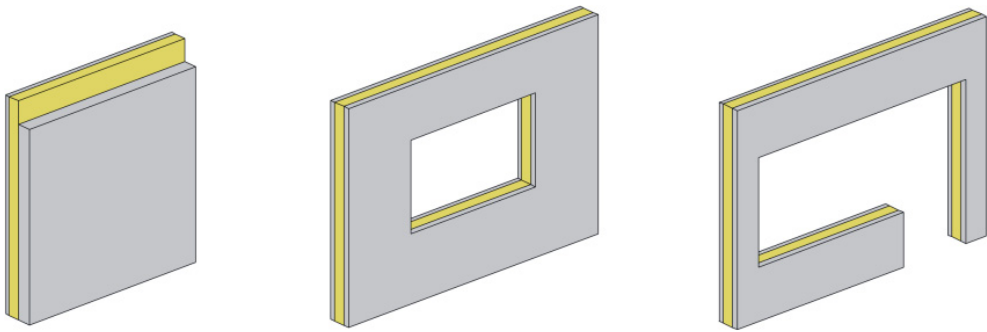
Main panel types from left to right: blind load-bearing panel; typical non-load bearing panel with a normal window, non-load-bearing balcony back wall panel.
